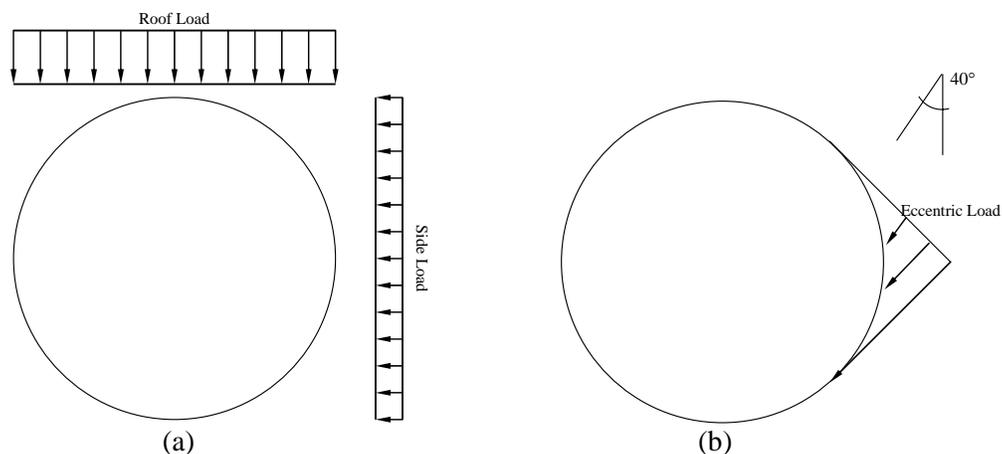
Rock Loads for Permanent Lining Design: (a) Uniform Roof and Side Loads; (b) Eccentric Load
